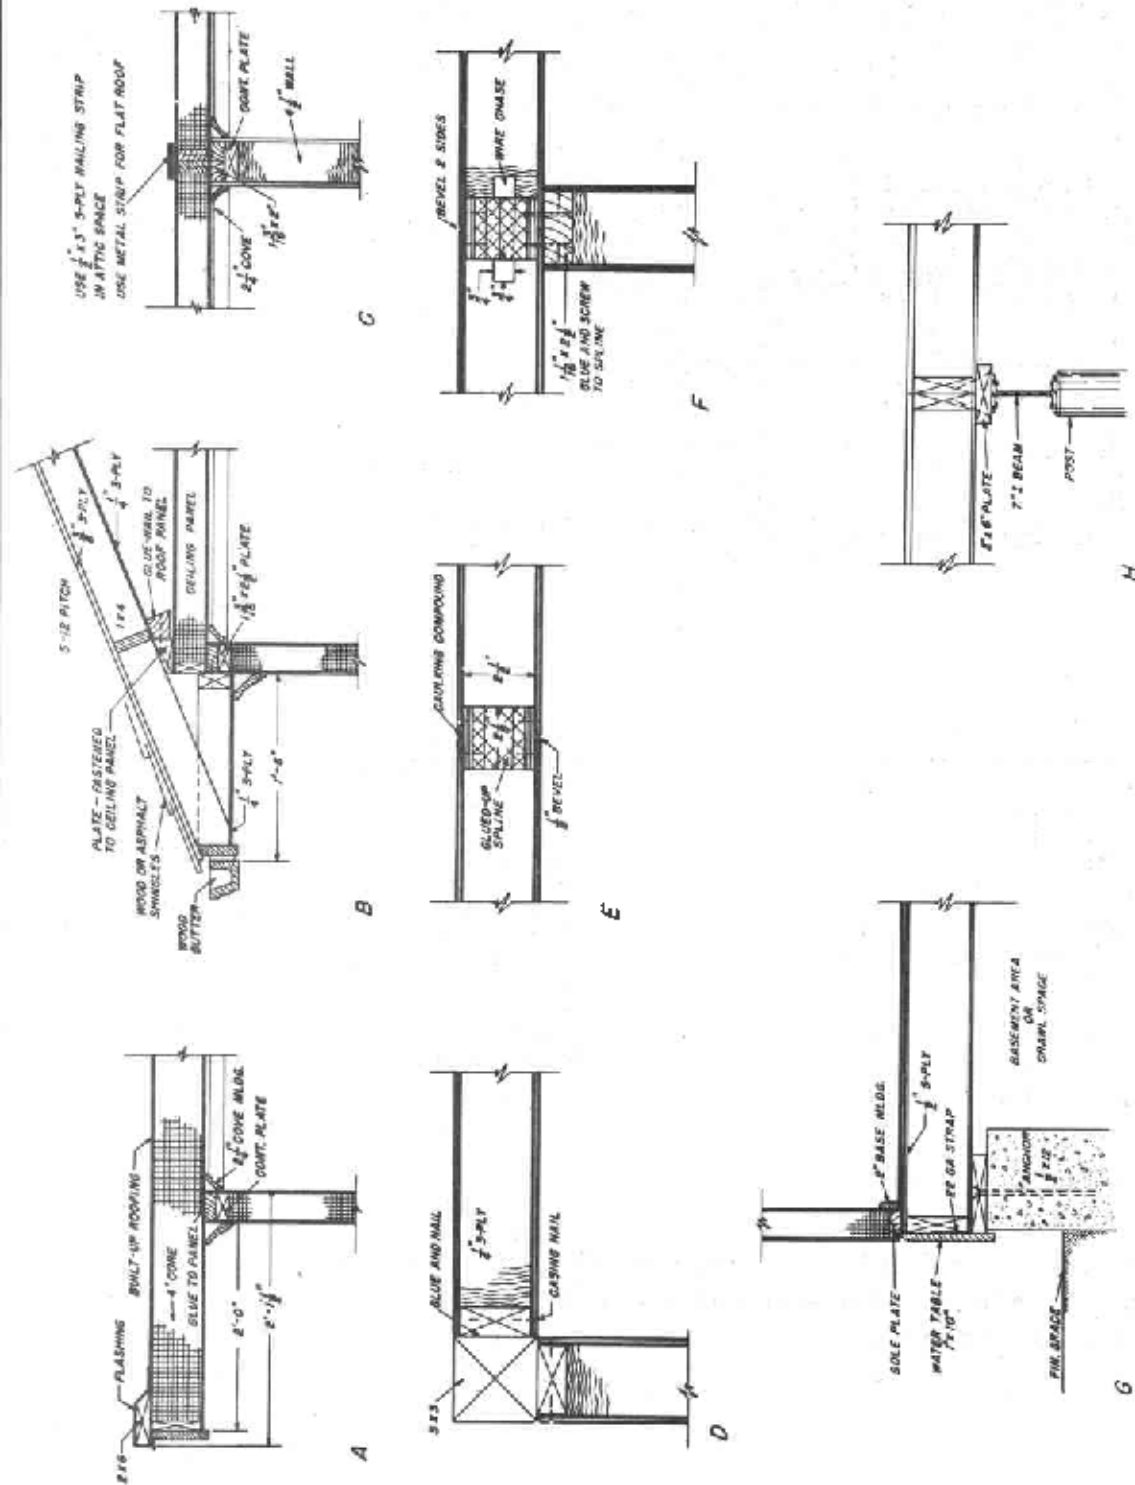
Essential joint details in a suggested design for a sandwich-panel house. A, flat roof; B, pitched, panelized roof; C, joint over center bearing wall for ceiling or flat roof; D, wall corner-post assembly; E, spline joint for wall panels; F, partition-wall joint; G, foundation-to-floor assembly; H, floor joint detail over main girder.
